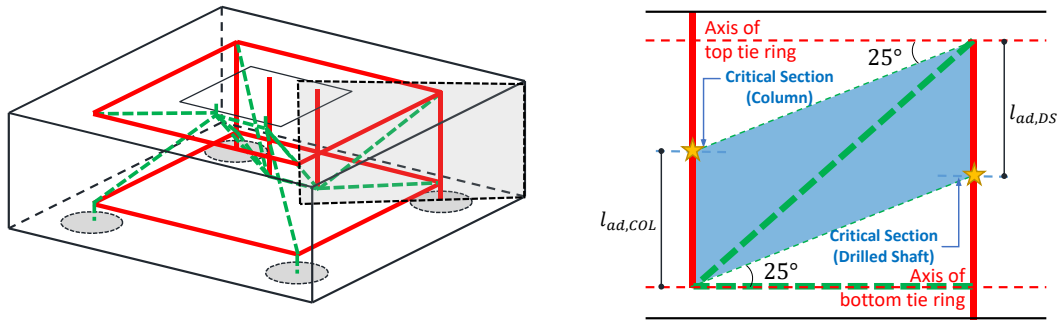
Assumed compression field and proposed critical sections of column and drilled shaft reinforcement (original Phase III loading condition)
